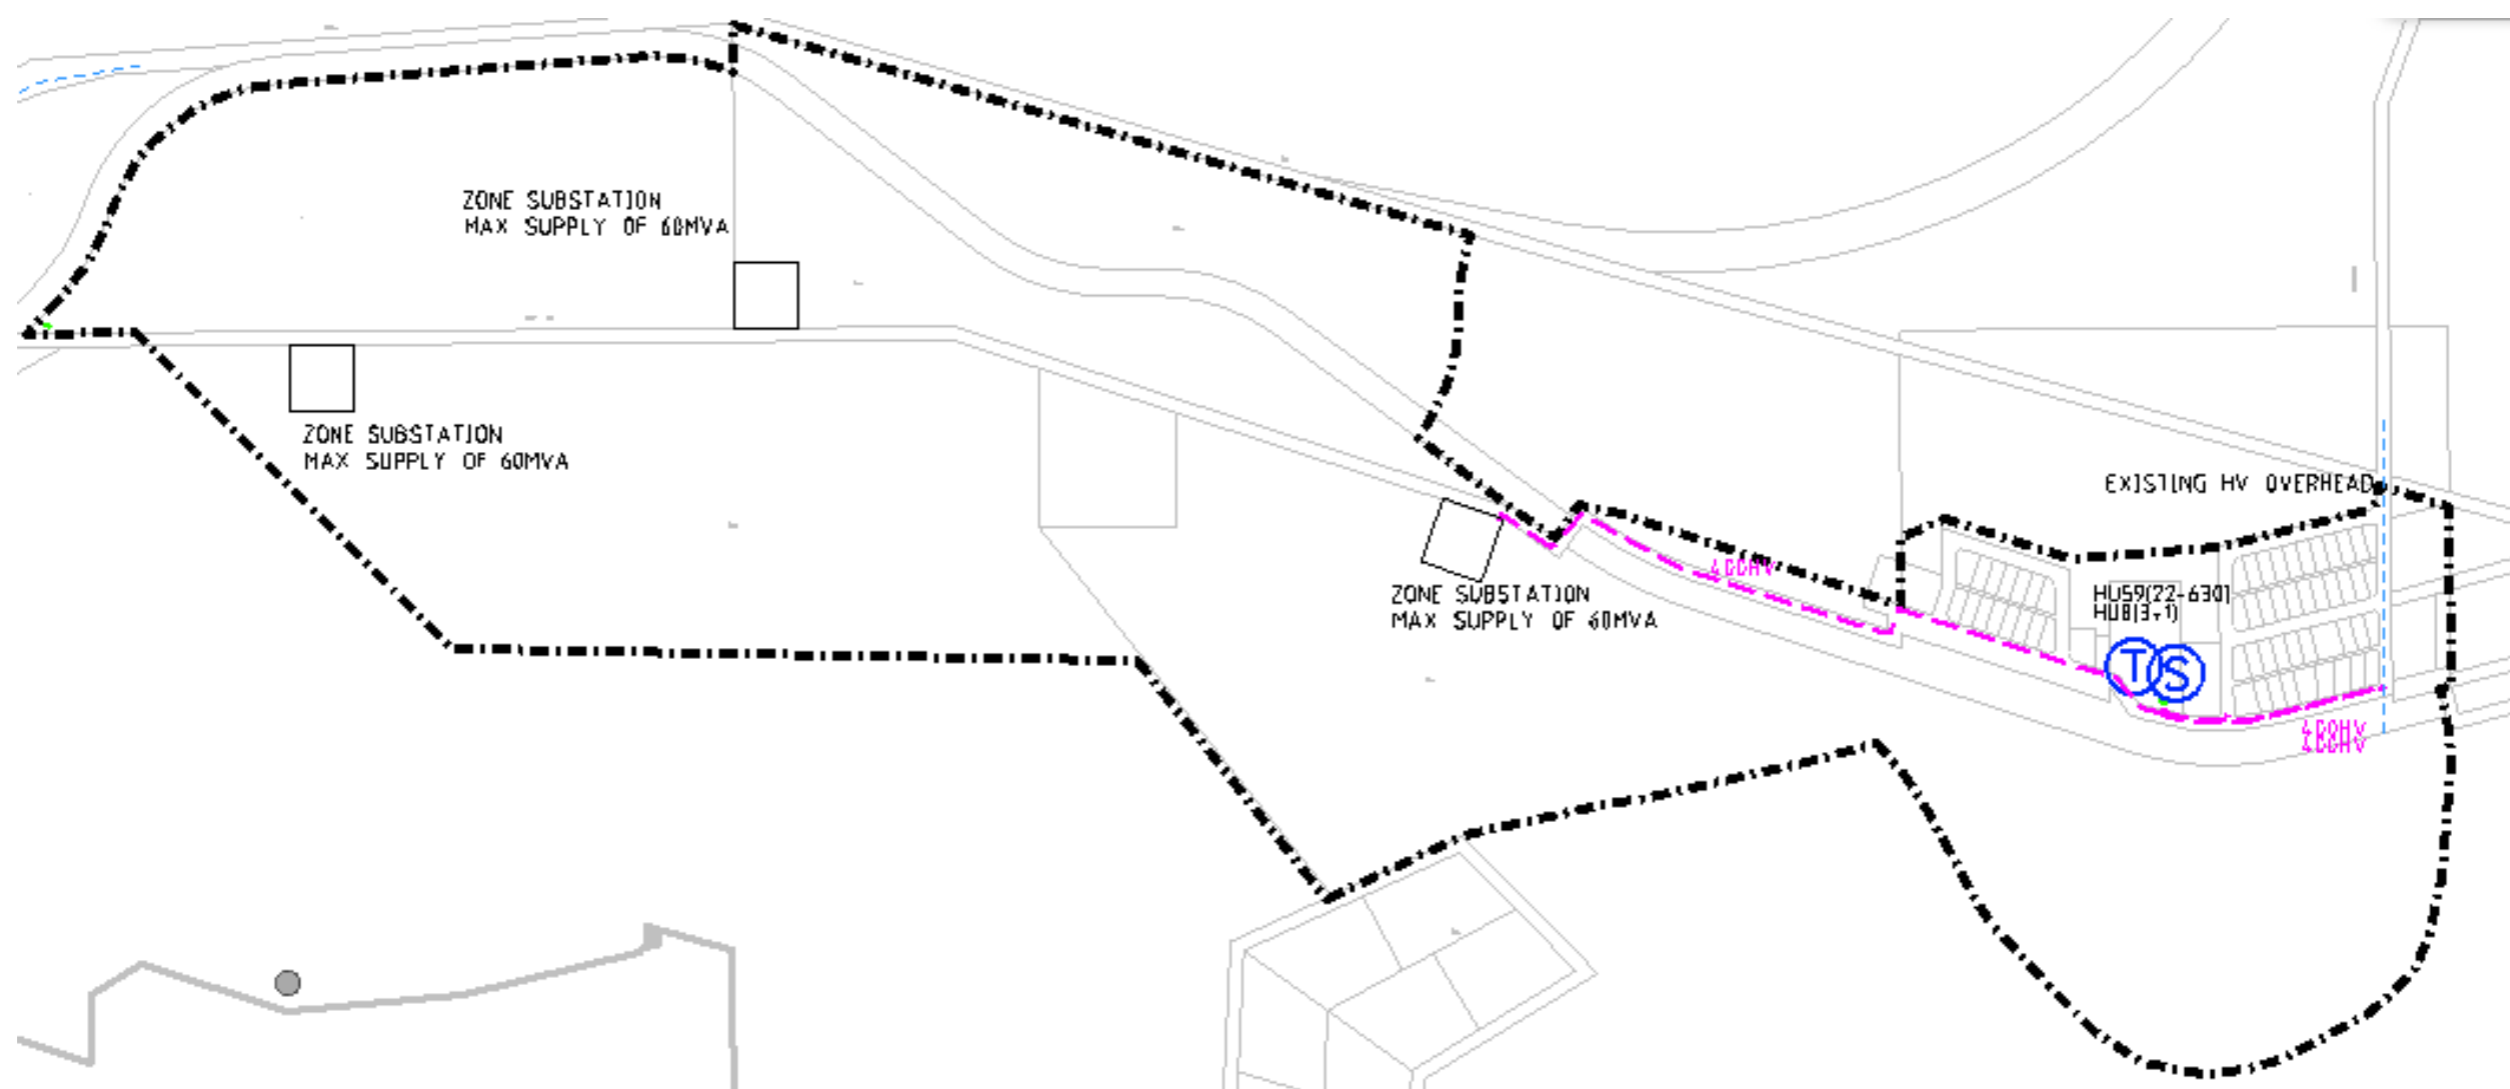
Multiple Zone Substations for above 60MVA load requirement.
